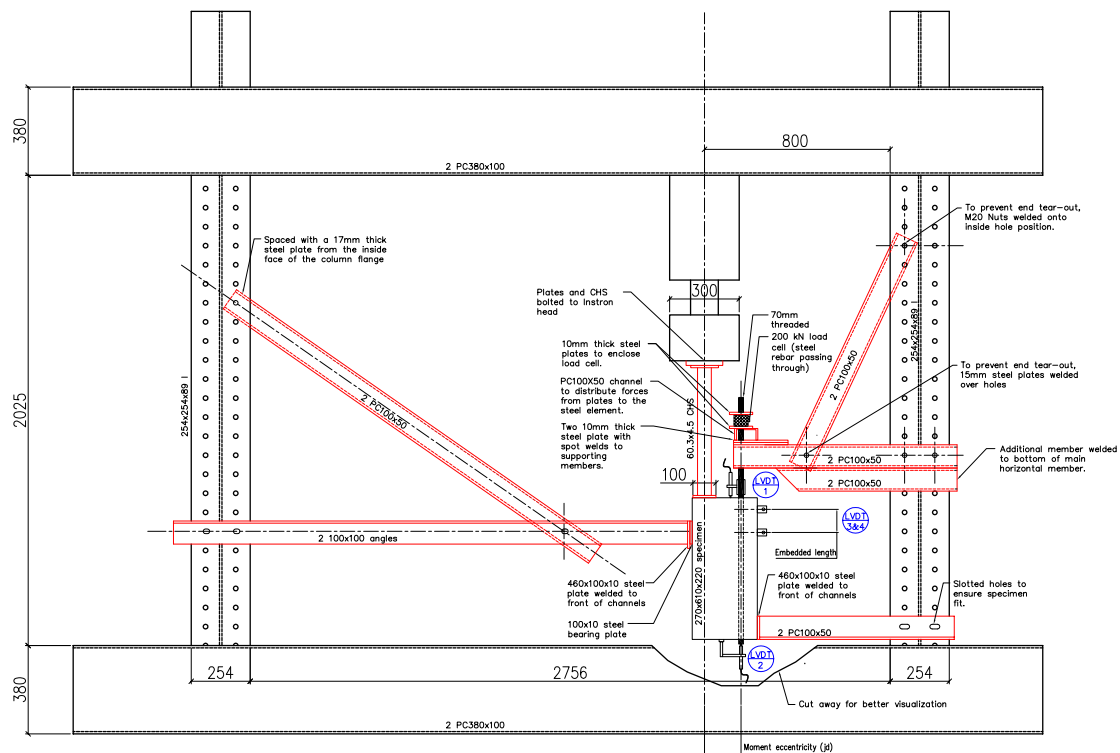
The beam-end test design drawing with indication of LVDT positions and fitting of specimen. Refer to Appendix C for the complete design drawing.
